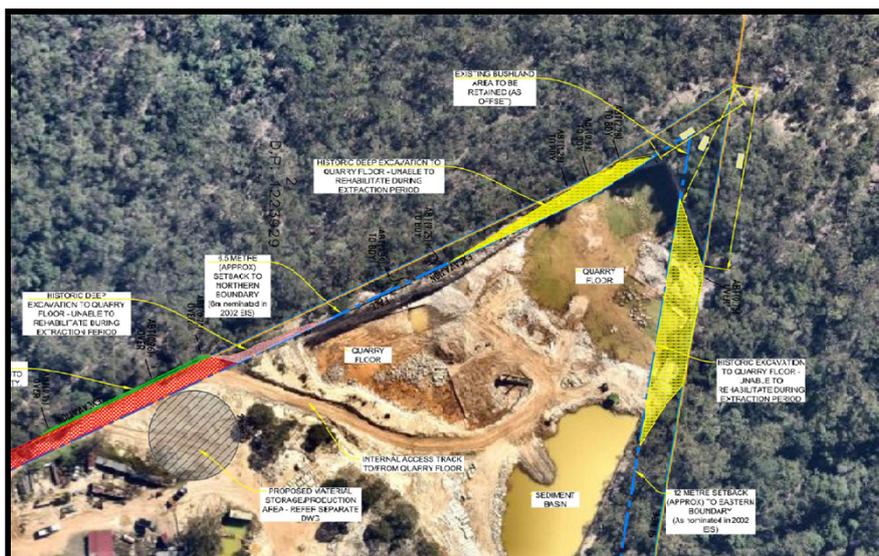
Encroachments into Minimum Setbacks and Adjoining Properties (Source: Part Site Plan/Setbacks, Rev B, 29 June 2023)
